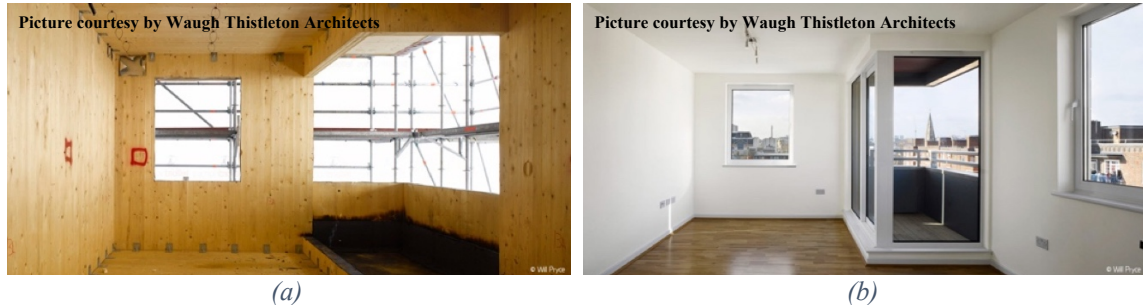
Full encapsulation of panelized structure. (a) Murray Grove building during construction, (b) CLT panels protected by gypsum boards.
